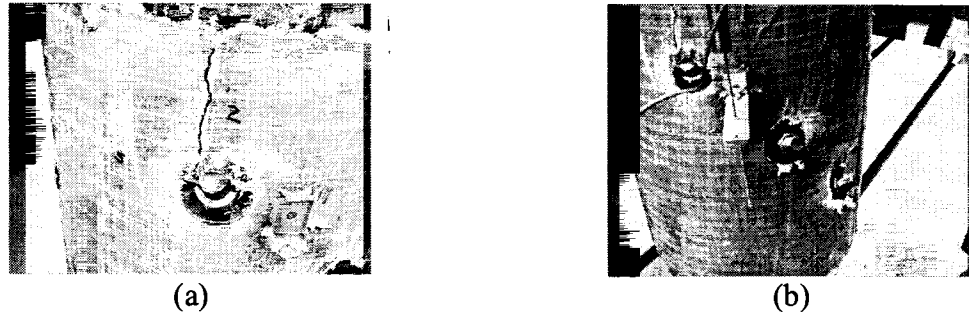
(a) Failed Wood Pile Section with FRP Composite Shell, Polyurethane Grout and Threaded Rods (Repair System C), (b) Threaded Rod Arrangement
